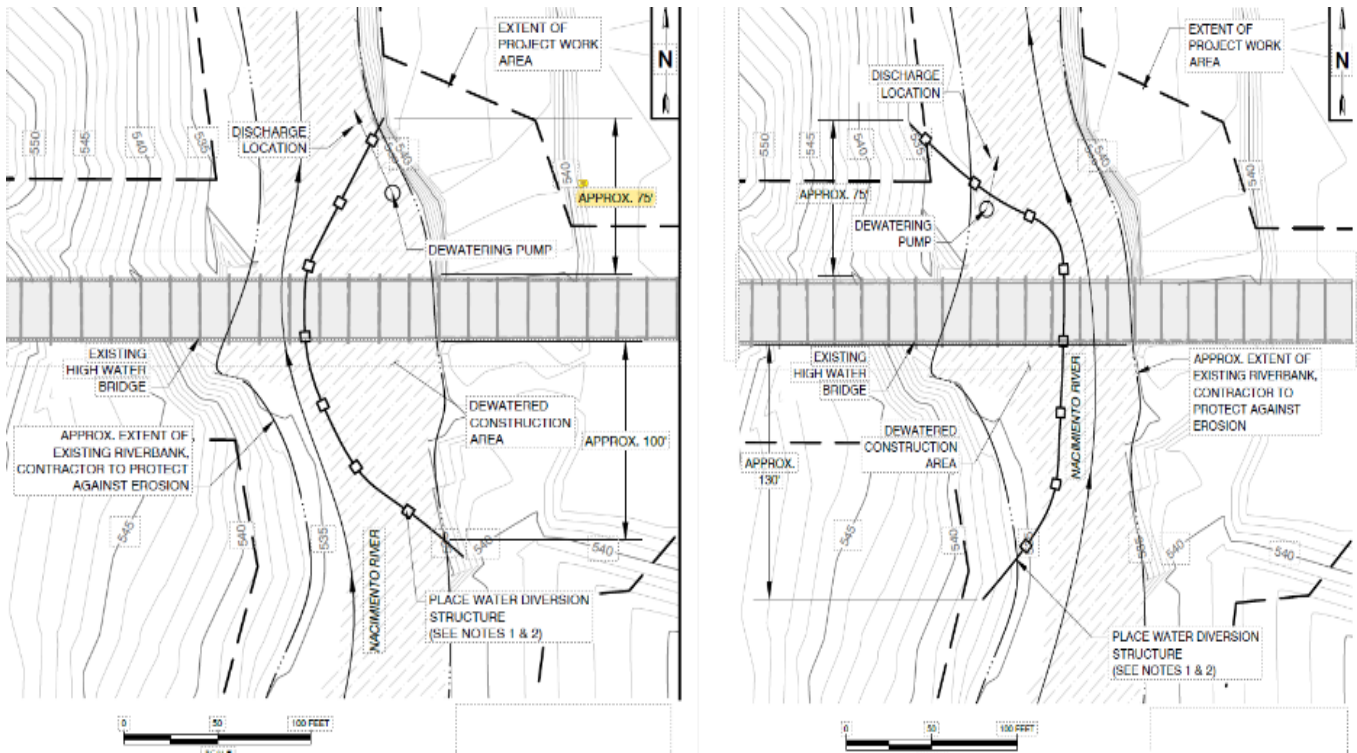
Eastern and Western Diversion and Dewatering Site Plans
